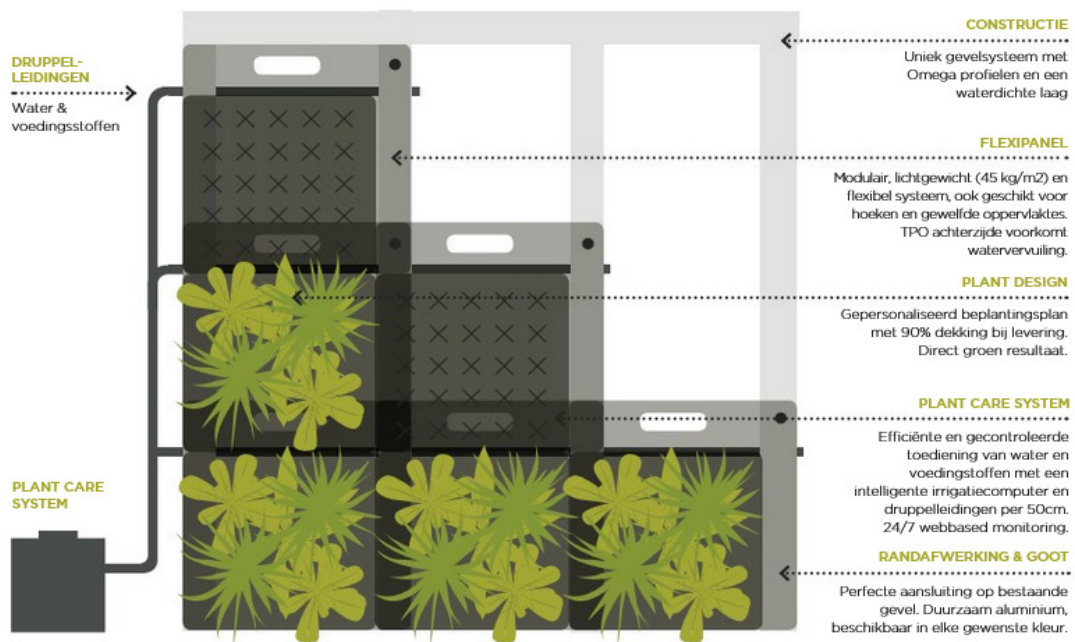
SemperGreen living wall system (sempergreenwall, n.d.)
